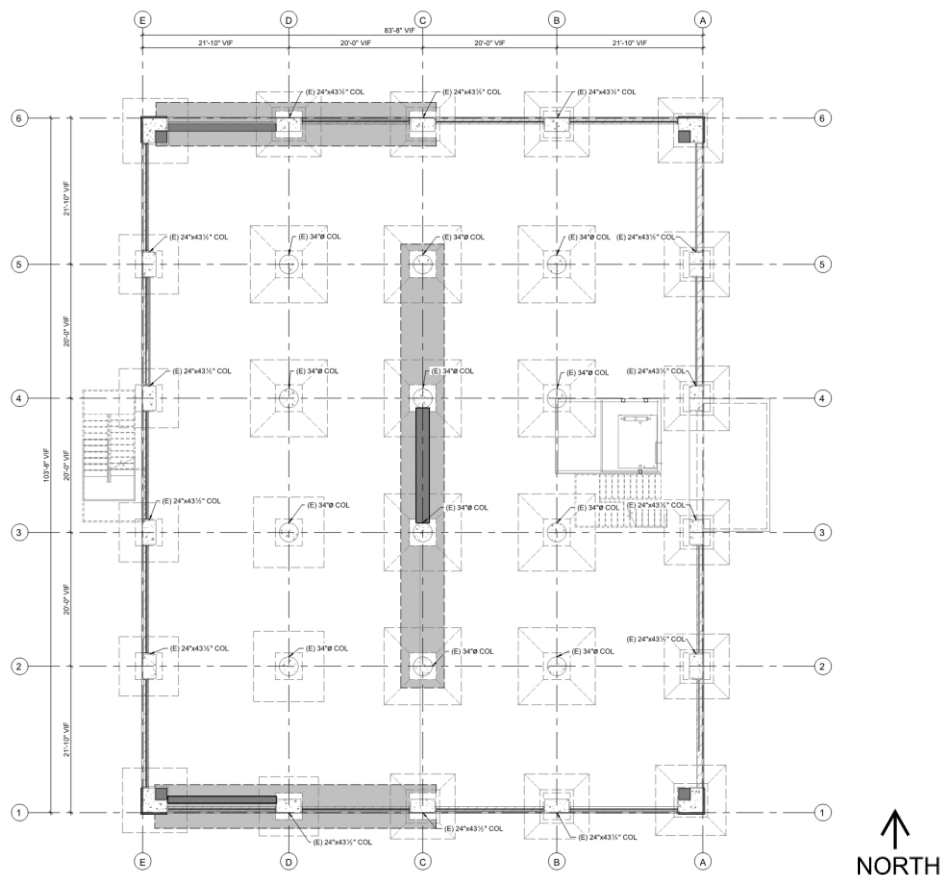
Working Group 2 cantilever shear wall building foundation and first floor plan.
